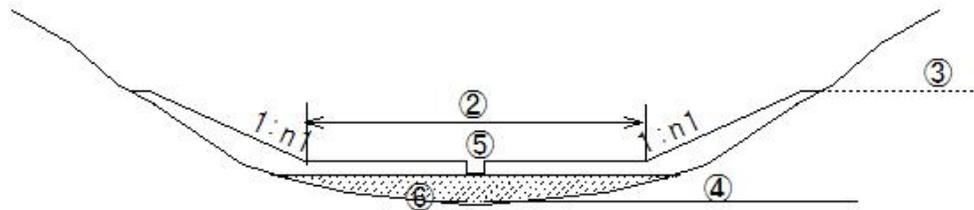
Example 2 of embankment cut-and-cover cross section when excavation affects the ground
